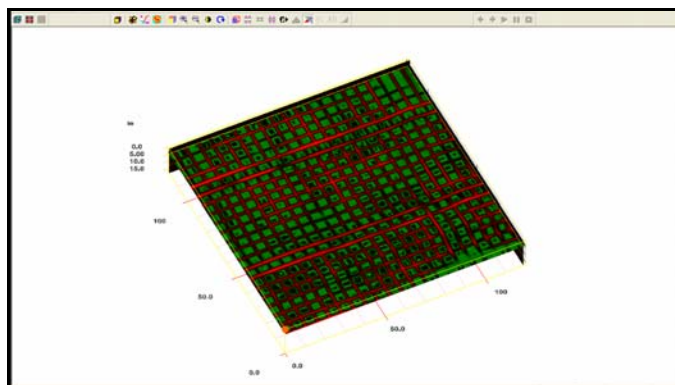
Super 3D file of a 10 foot × 10 foot section of warehouse floor. Six-inch wire mesh.
